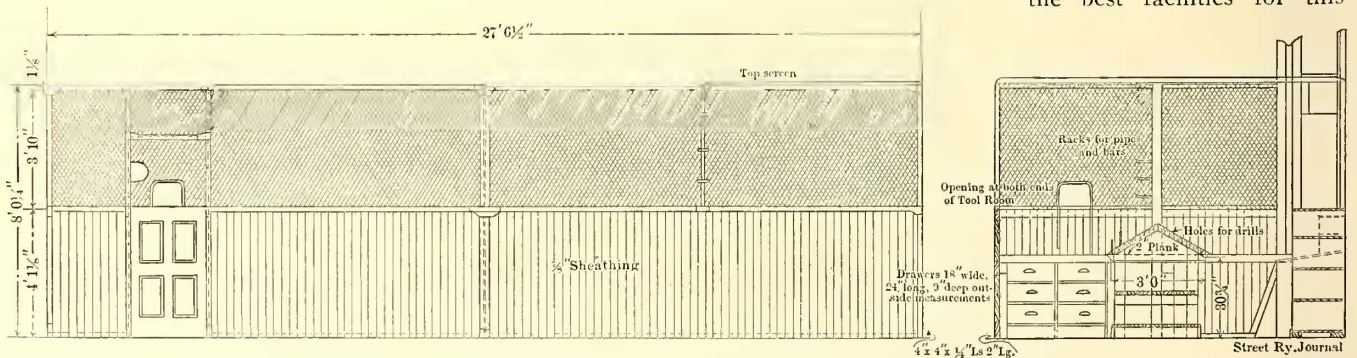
PLAN, ELEVATION AND PART SECTION OF THE TOOL ROOM
